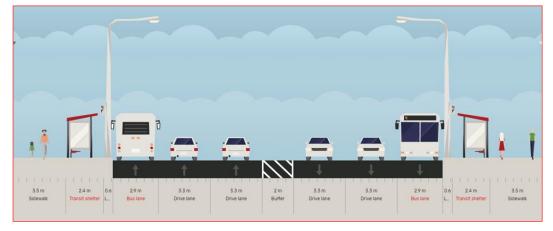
Proposed on-street bus hub cross-section on Taurikura Drive between Tauranga Crossing and Whiore Avenue
